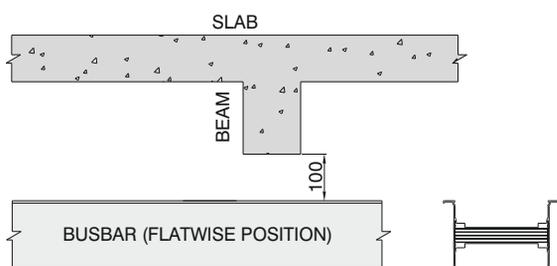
CROSSING UNDER A BEAM HORIZONTAL POSITION
